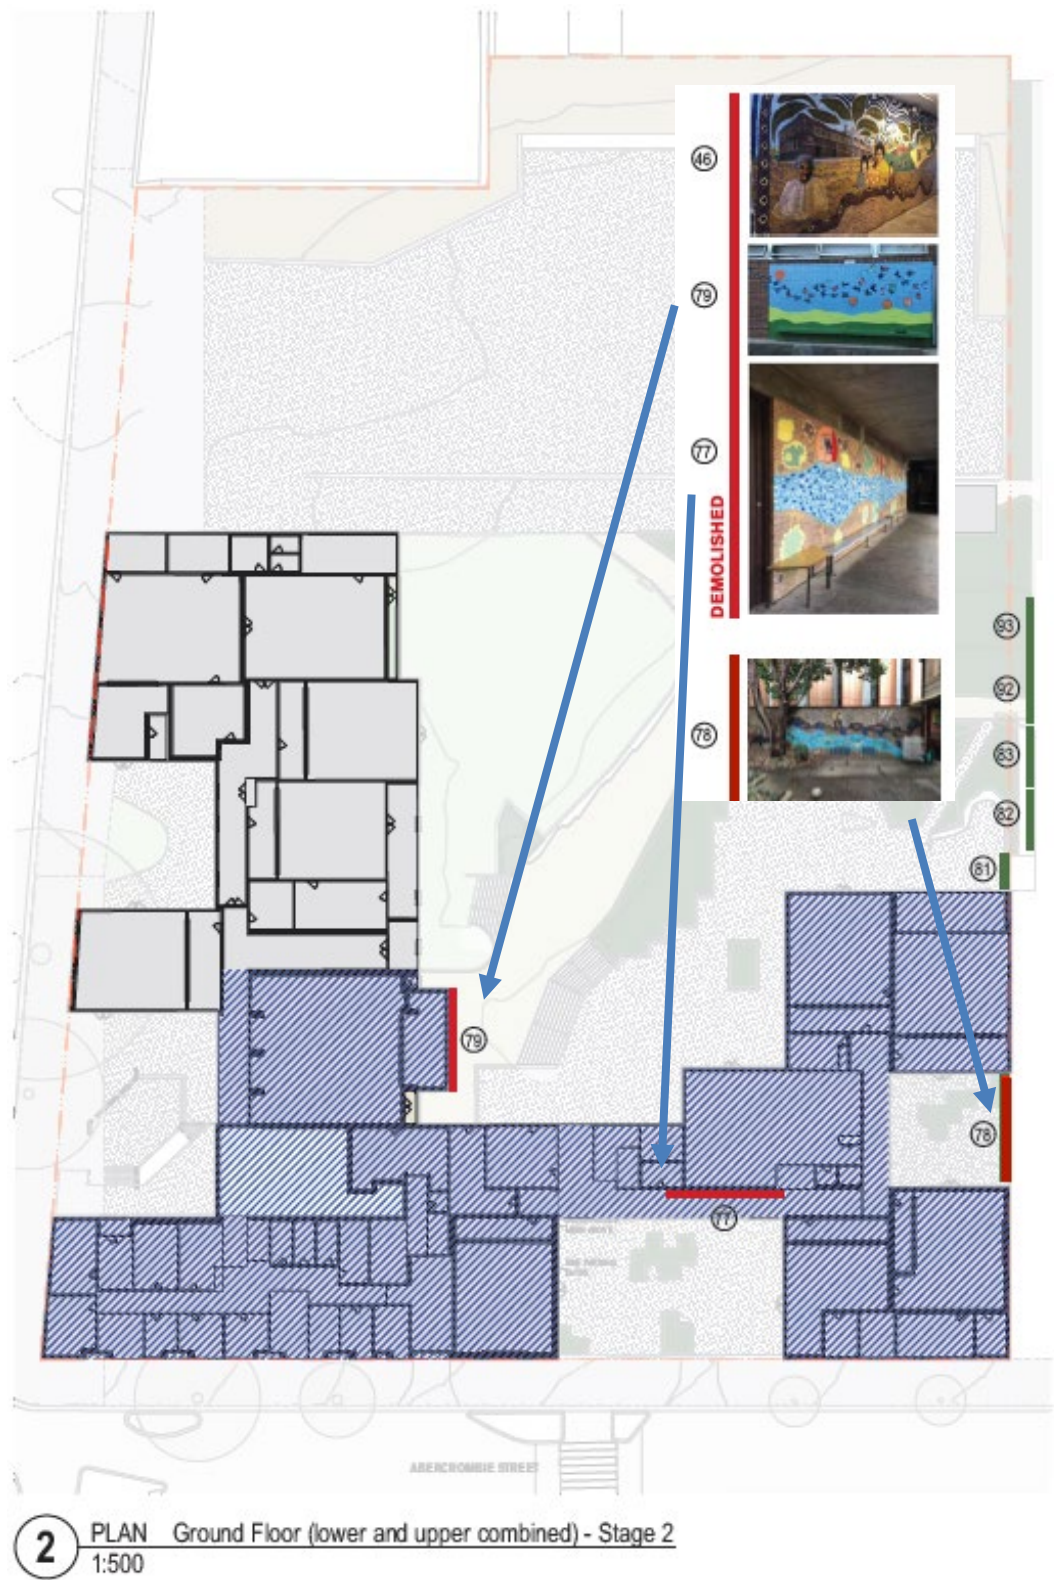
Brick Mural Demolition Plans, Stage Two. (Source FJMT 2020)
